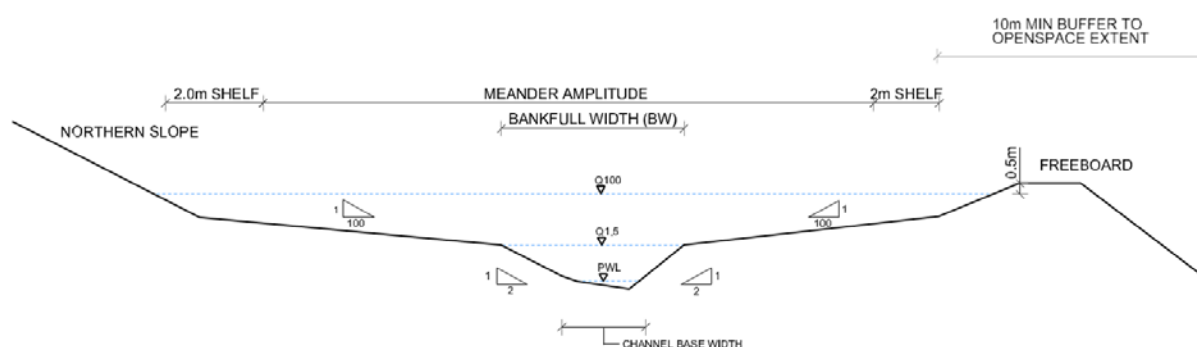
Typical section of the northern realignment in terms of flooding profiles
